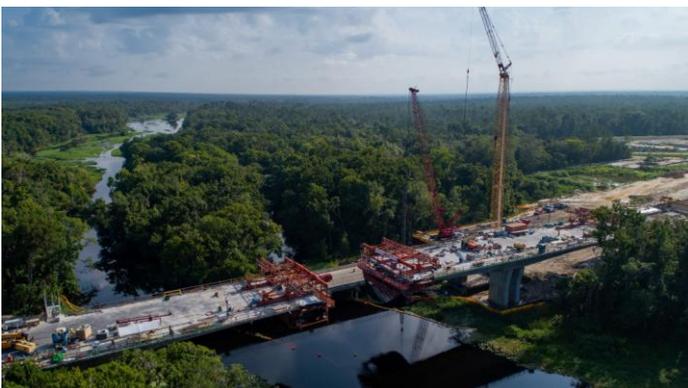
Wekiva River Bridges - Service Road Bridge Construction
